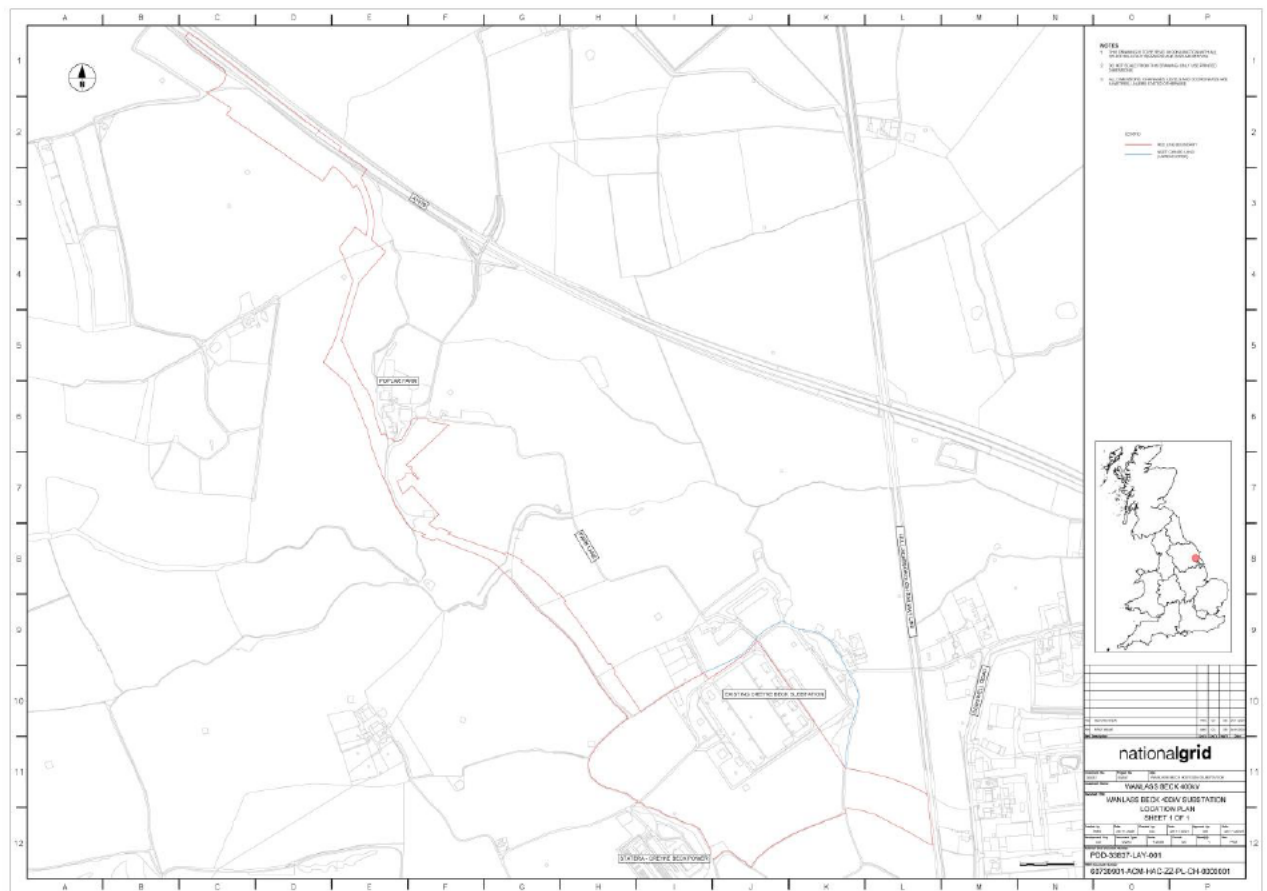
Location Plan of Wanlass Beck new 400kV substation
